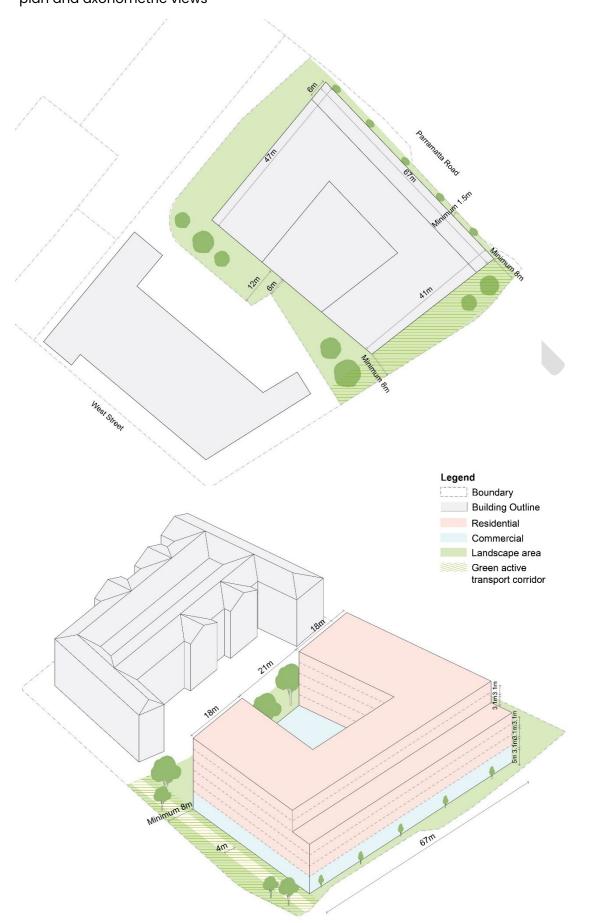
Indicative Opportunity Site 3 - storeys, building envelope, scale and site layout requirements - plan and axonometric views
